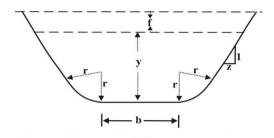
Trapezoidal Round Cornered Section of Canal with Free Board
